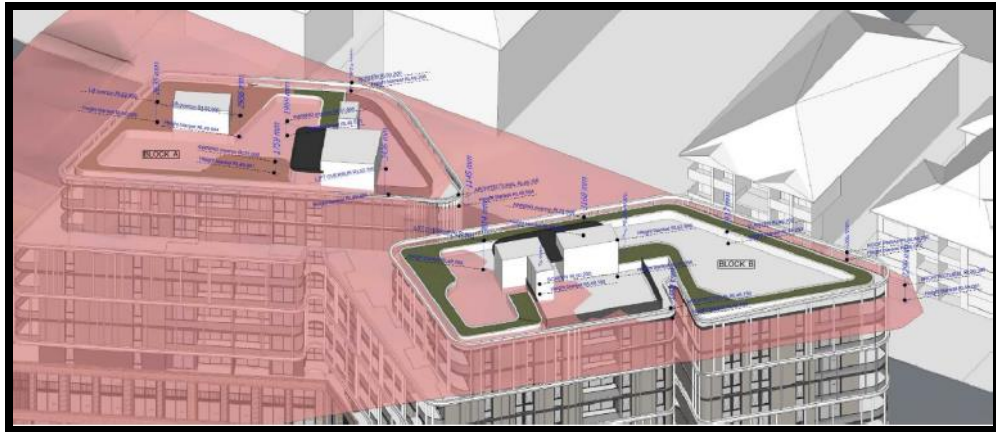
Height plan drawing which illustrates the components which are above the height control (Source: PBD Architects).
